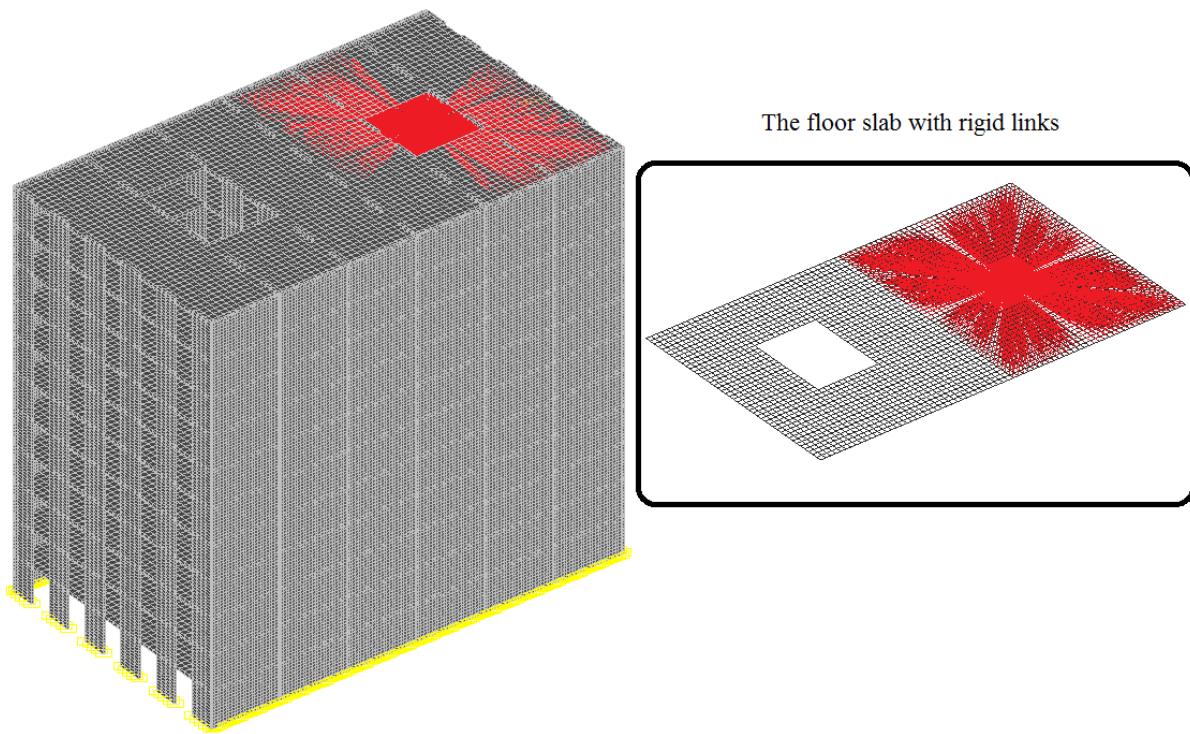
Design model of a multistory building (94 362 nodes, 91 811 finite elements). Half of each floor slab is modelled by a rigid body.
